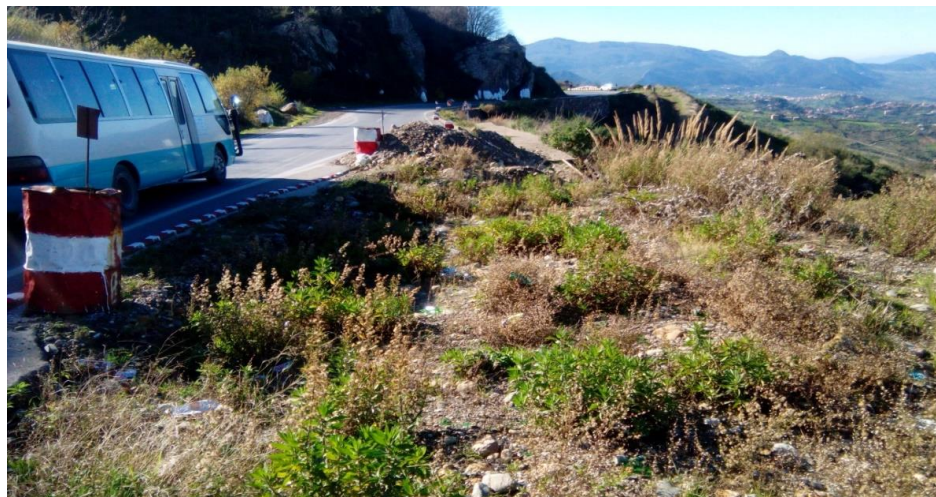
Structural failures and pavement rupture along the half-carriageway section
